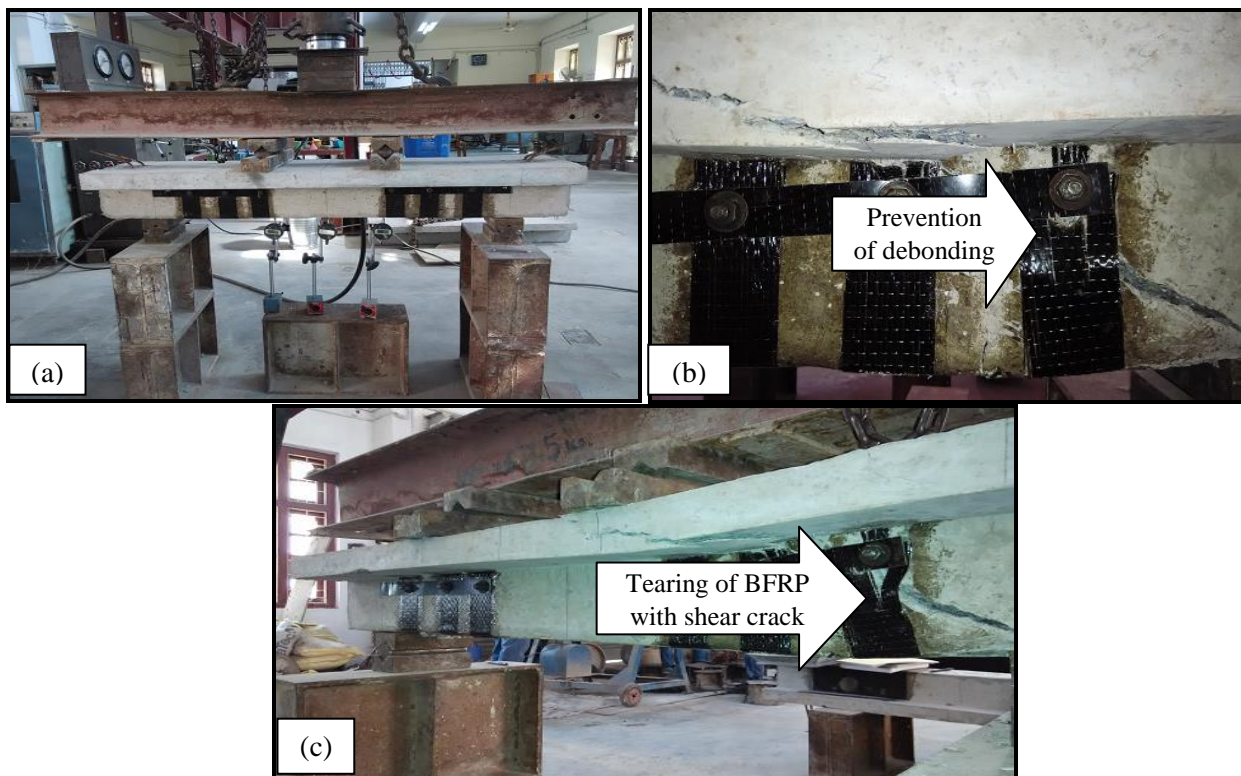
(a) Experimental Setup of beam SB12 under four-point loading system, (b) Prevention of debonding of BFRP strip due to Anchoring System, (c) Ultimate failure of beam SB12 by tearing of BFRP strip followed by diagonal shear crack
